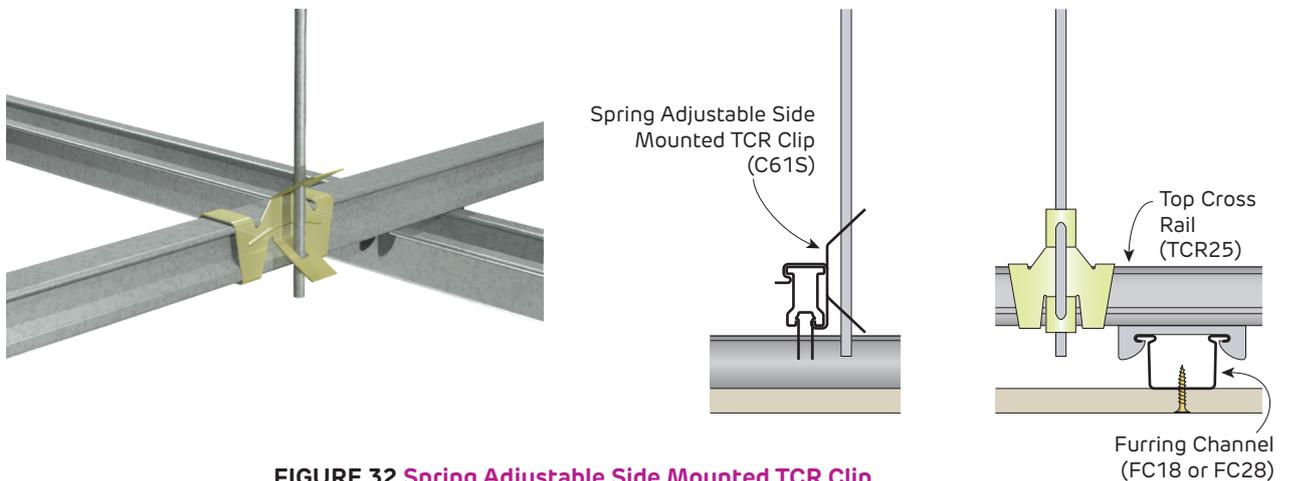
Spring Adjustable Side Mounted TCR Clip
